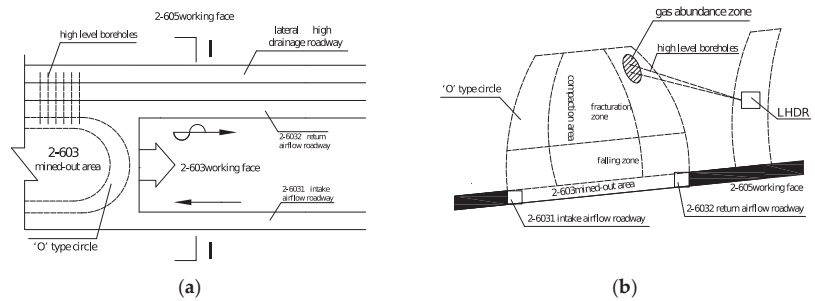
Surrounding rock structure mechanical model of high-level boreholes: (a) planar graph; (b) I-I section drawing.
